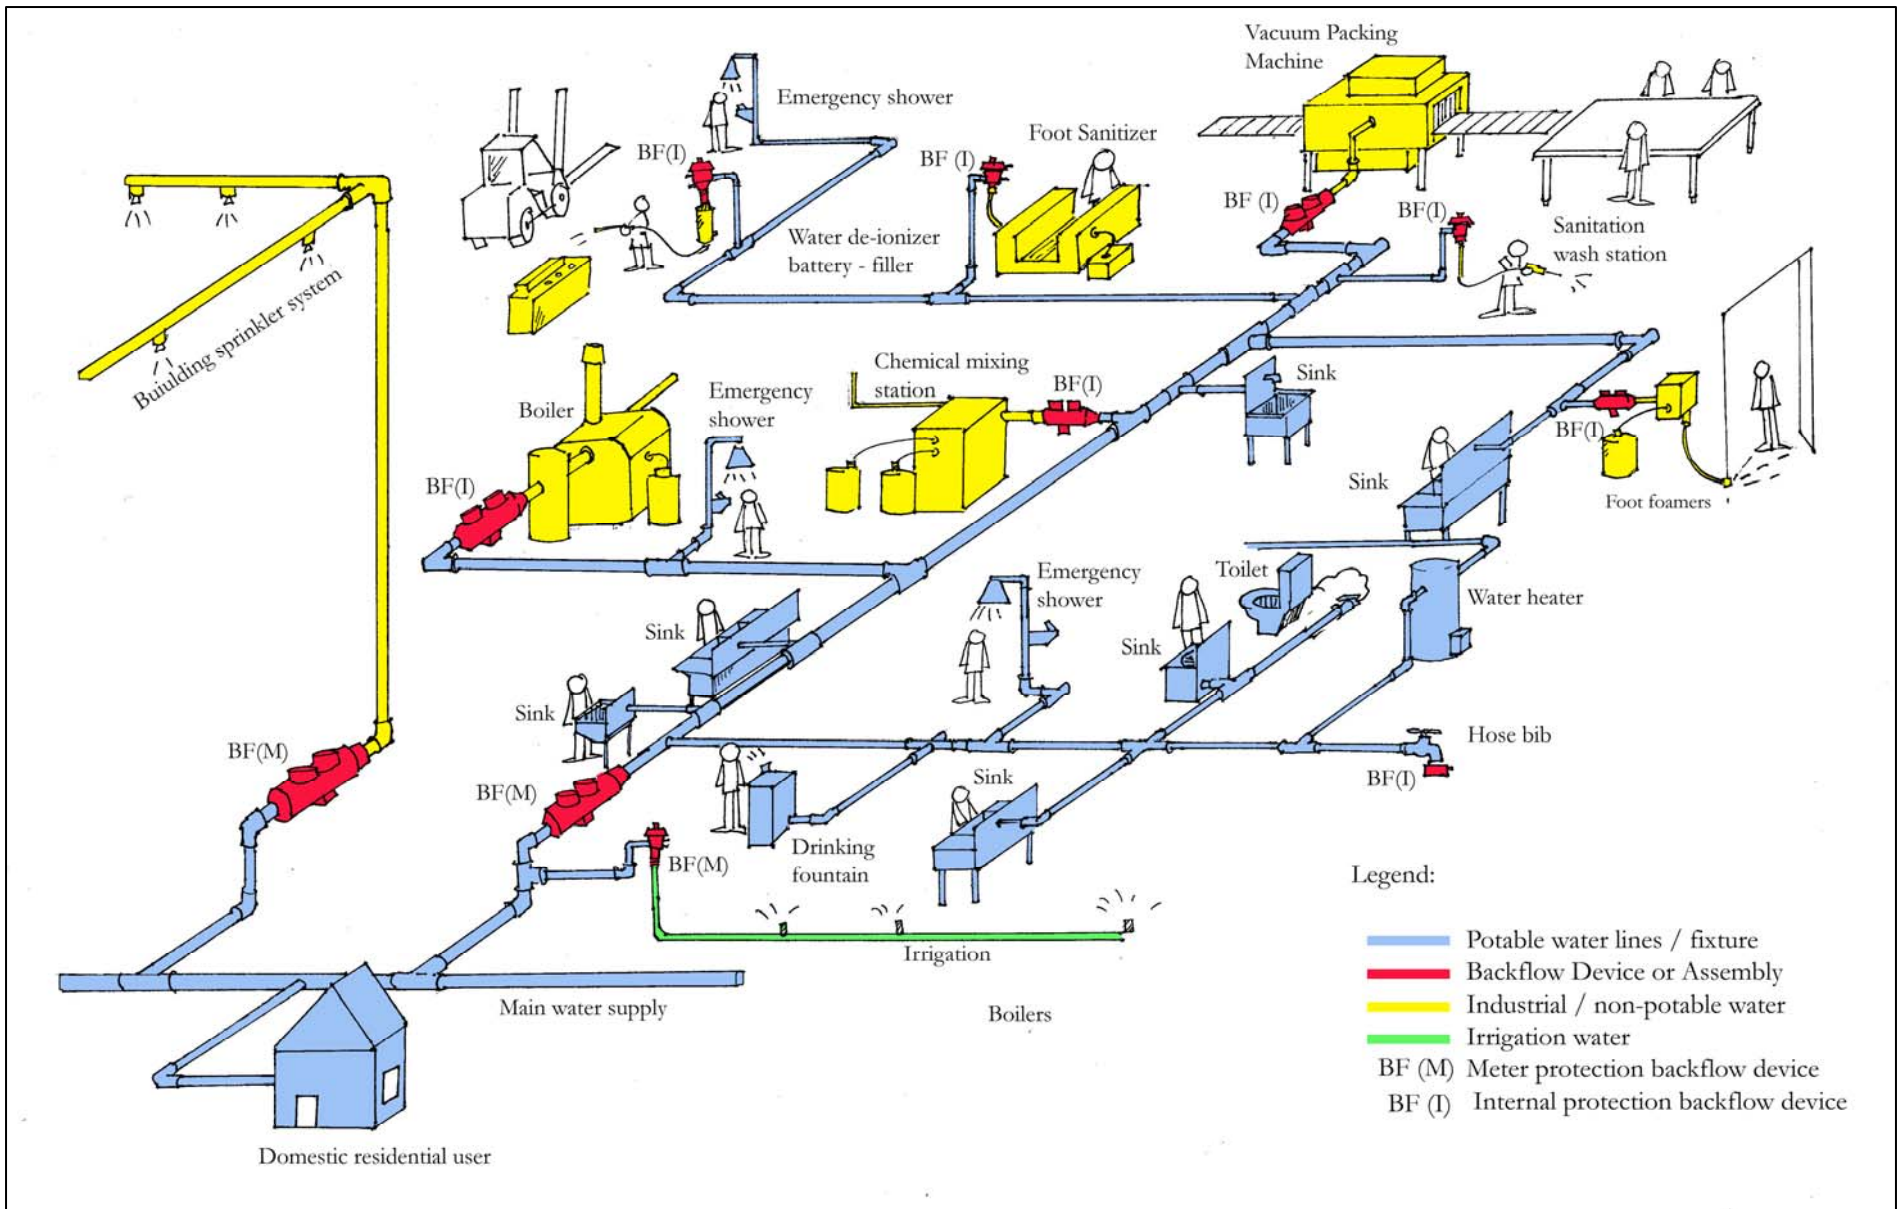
Typical wholesale food facility plumbing layout and recommended areas for backflow device installation
